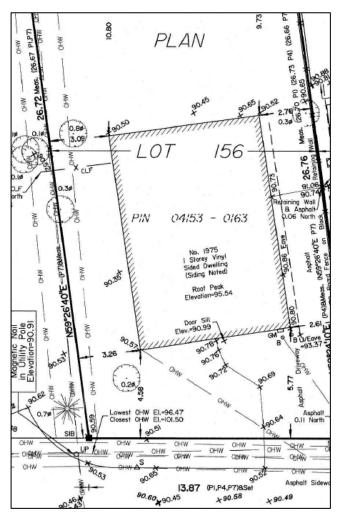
Topographic survey of existing dwelling at 1975 Banff Avenue
